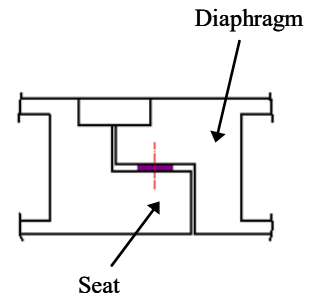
Types of in-span hinges in box-girder bridges (not in same scale).
